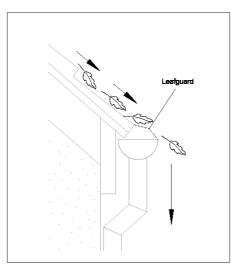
Filtration traps, as shown, could be fitted on the gutters which can easily be maintained at 2-3m above ground.
